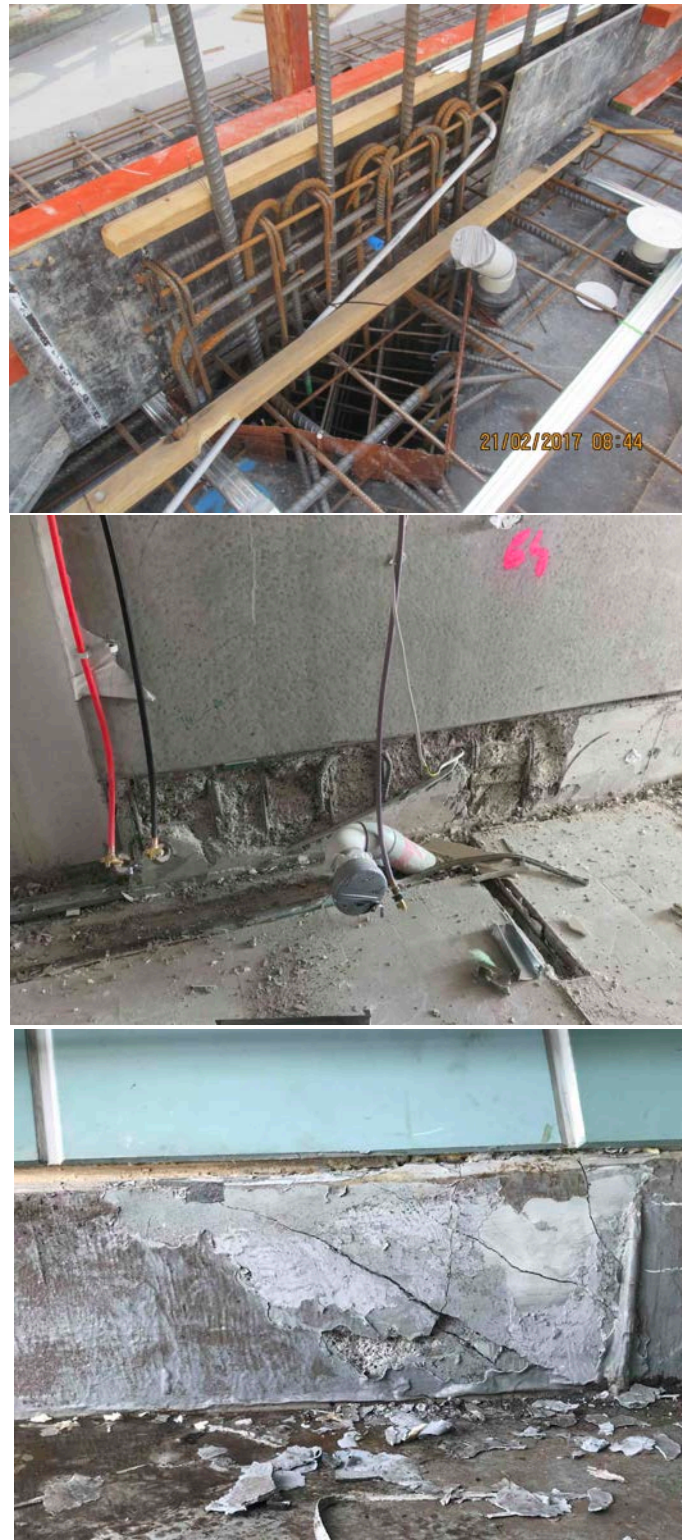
Photographs of the hob beam in the vicinity of column 38 at level 10, prior to pouring concrete (top photo), inside the building on 8 January 2019 after cracked concrete cover removed (middle), and outside on 8 January 2019 after the garden and waterproof covering removed (bottom). Note the positioning of the reinforcing bars, the encroachment of the column bars into the cover zone, the lack of anchorage of some horizontal bars, and the encroachment of a conduit into the concrete cover zone. The vertical dowel bars that engage with the precast concrete panels can also be seen in the top photograph.
